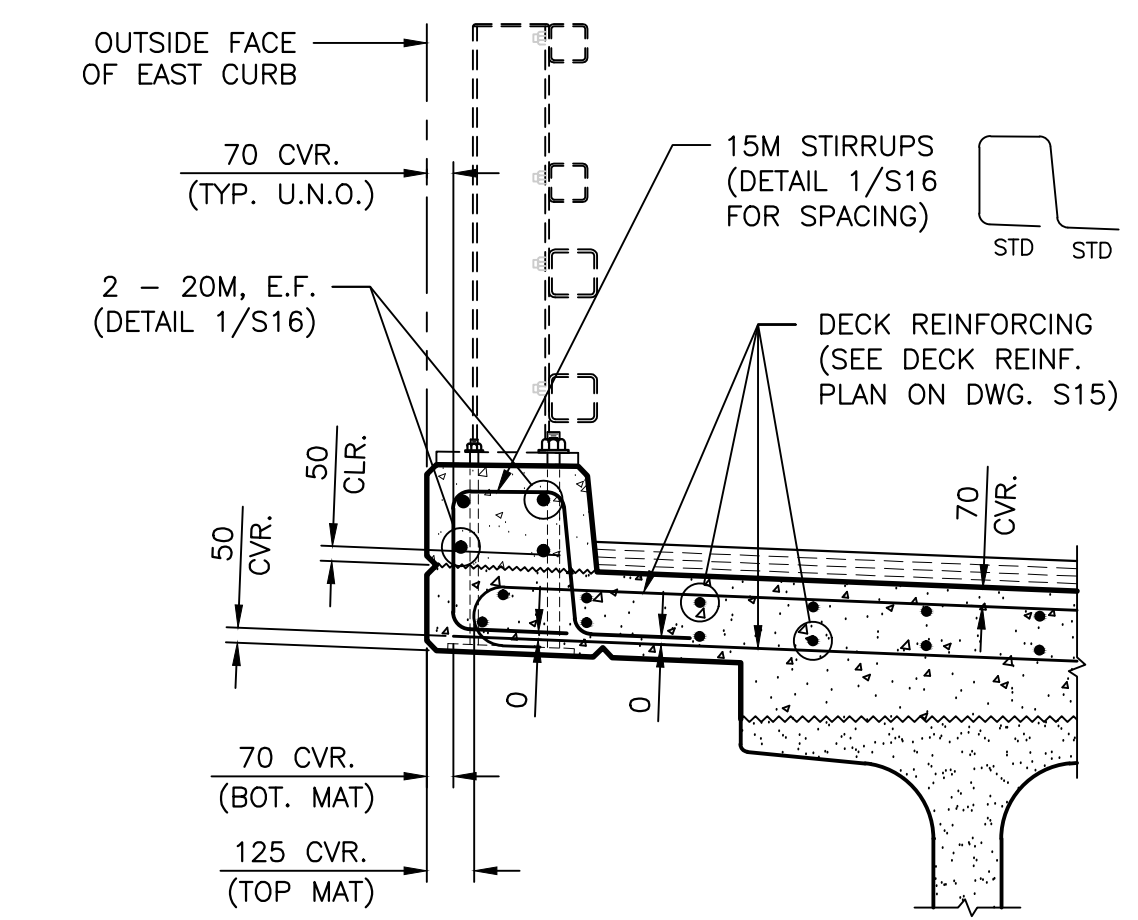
DETAIL - EAST CURB REINFORCING PLAN (1) S15
